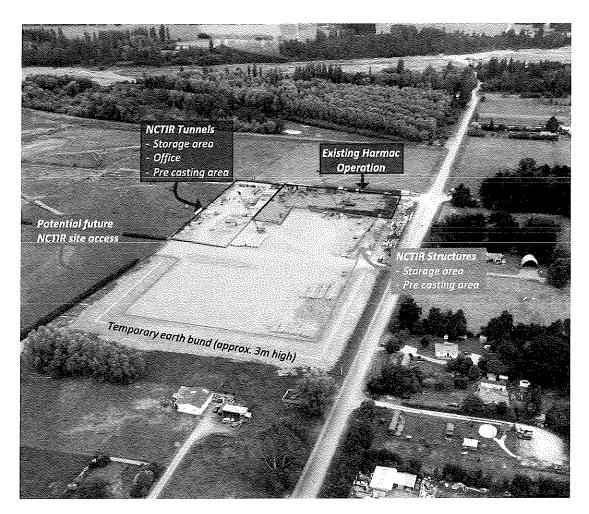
YARD LAYOUT - INDICATIVE AREAS
